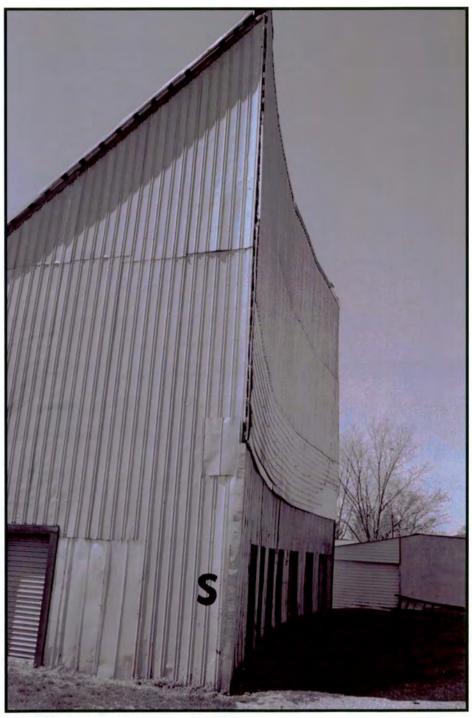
Twilite Drive-In – looking west at screen tower; note doors cut into front of screen, storage building extension to rear, and truncating of end of screen
